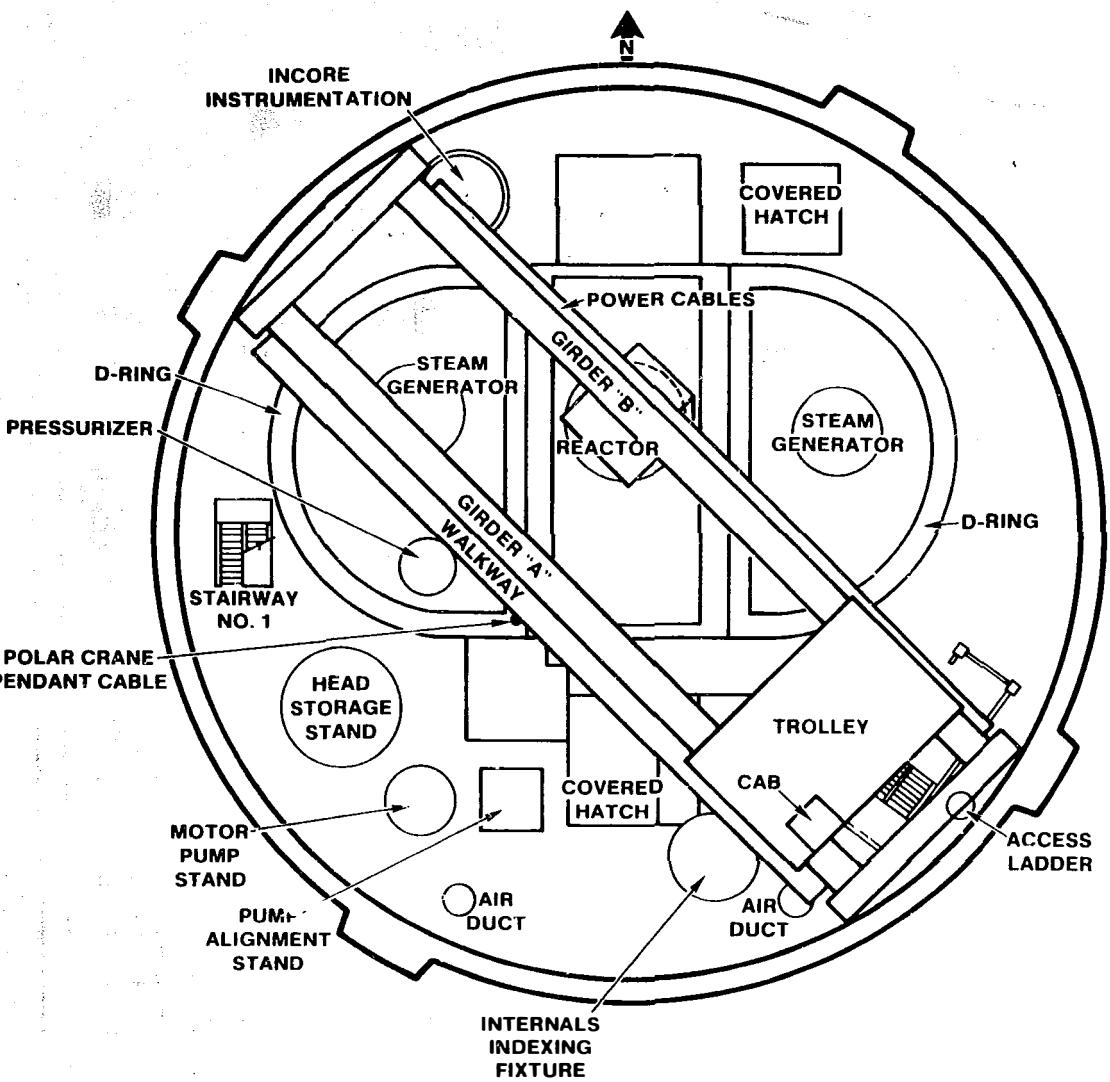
Floor Plan of Elevation 347, with Polar Crane Superimposed.
